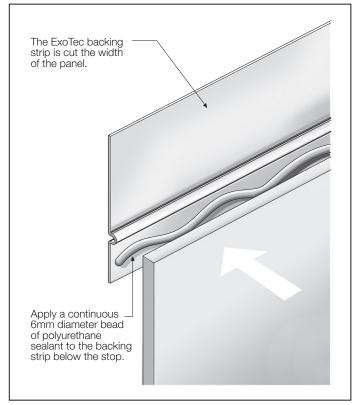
EXPOSED HEAD FASTENER DETAIL
